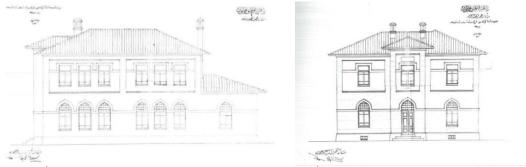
a) İbrahim Paşa Primary school Side Facade, b)İbrahim Paşa Primary school Front Facade [42]
